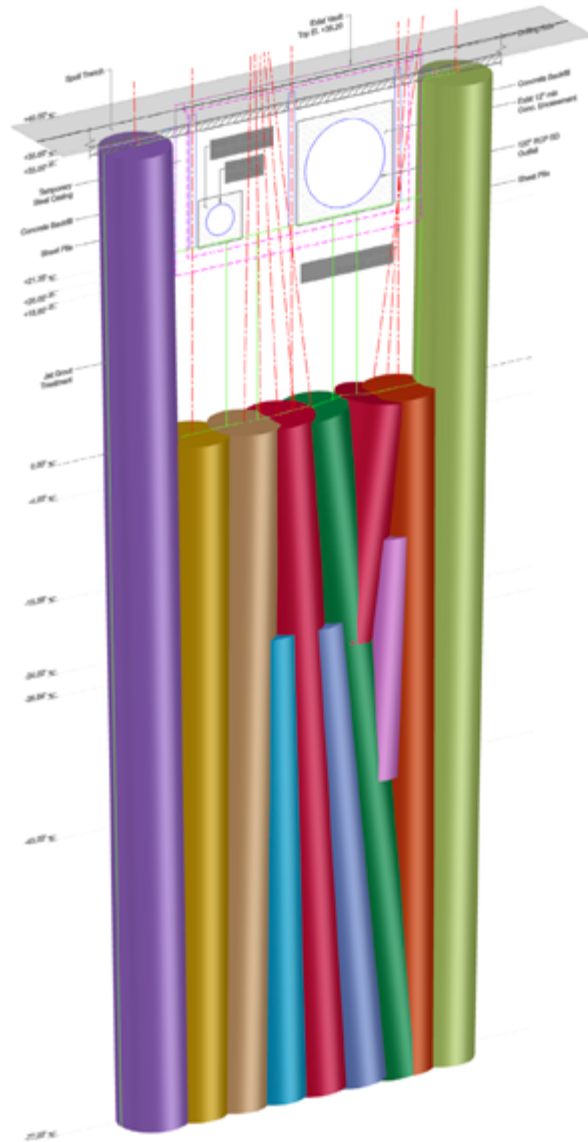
| Pioneer Reservoir Outfall Crossing S1 columns execution
